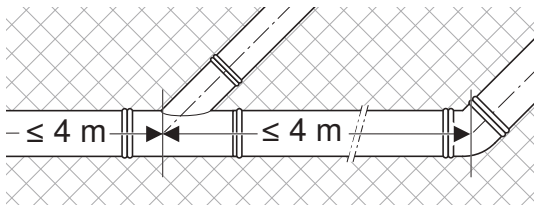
Reduced branch fitting 45°, pipe length up to 4 m
